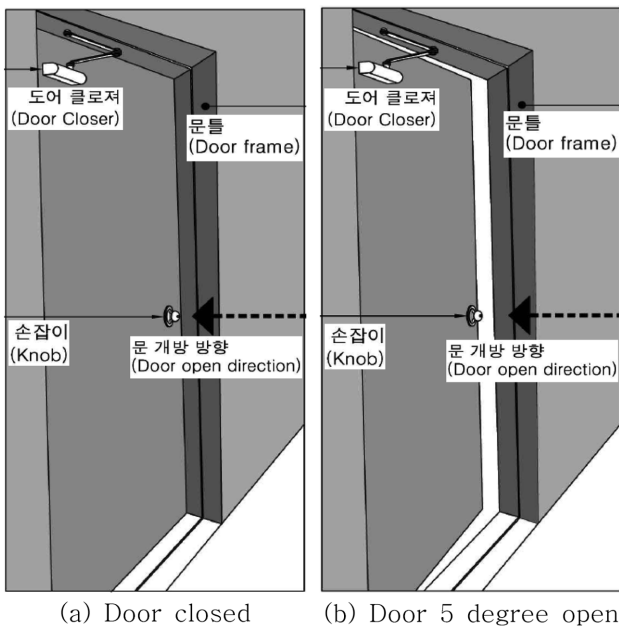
Measurement of opening forces of an access door before and after operating a smoke control system.
